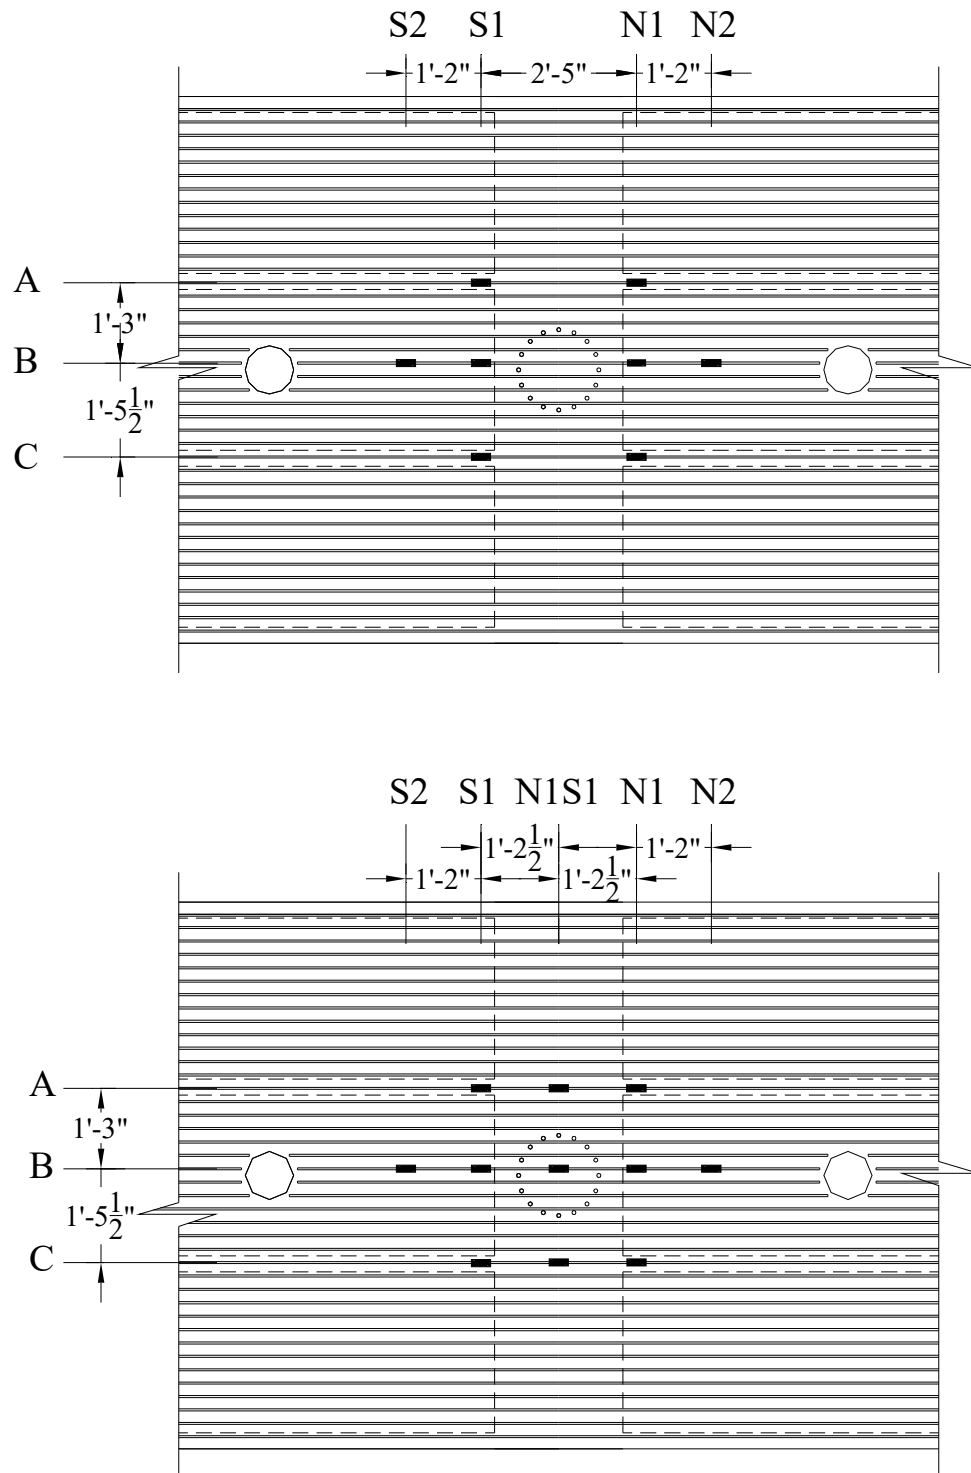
Layout of strain gauges used for the box-girder soffit slab (top) and deck slab (bottom) longitudinal reinforcement.
